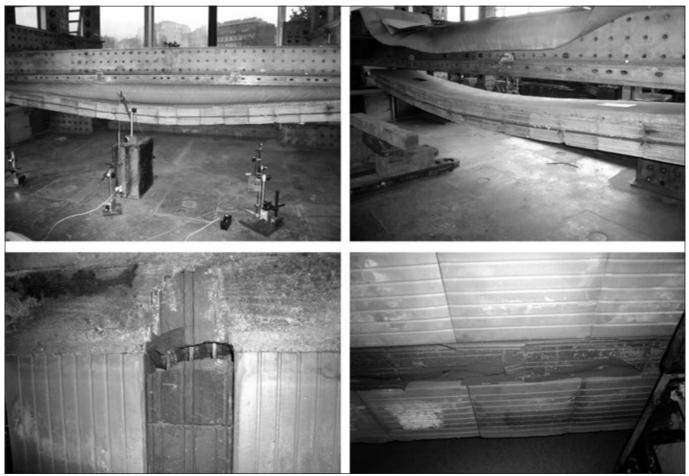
Testing of a shorter (F-1 type) specimen in the Structural Laboratory
